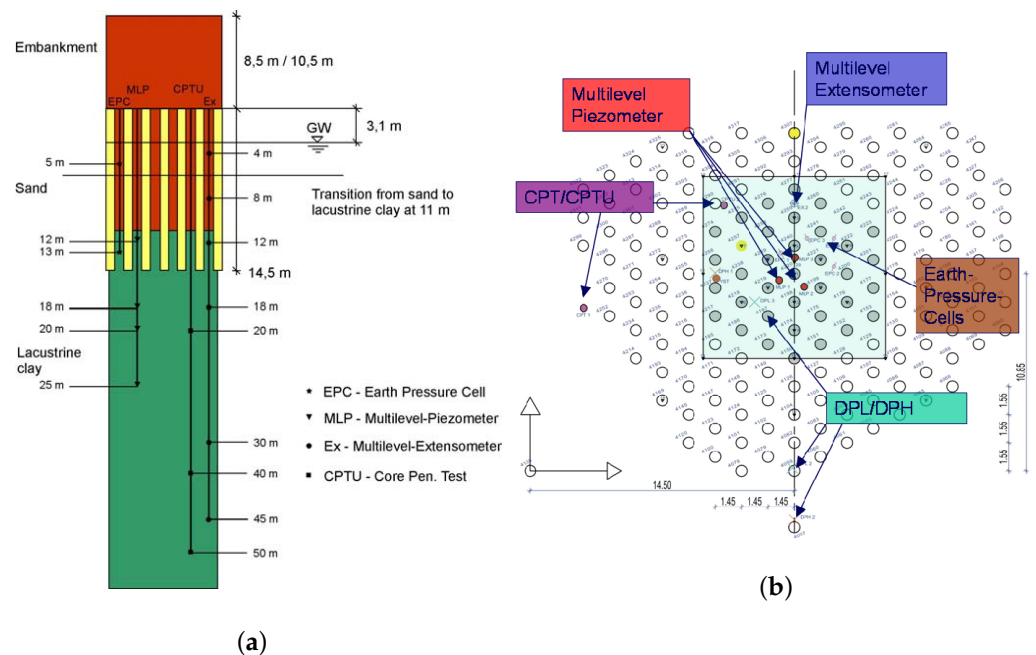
Details of Klagenfurt site. (a) Cross-section with soil layers and measuring devices; (b) plan view of arrangement of granular column and measuring device in field, ref. [16].
